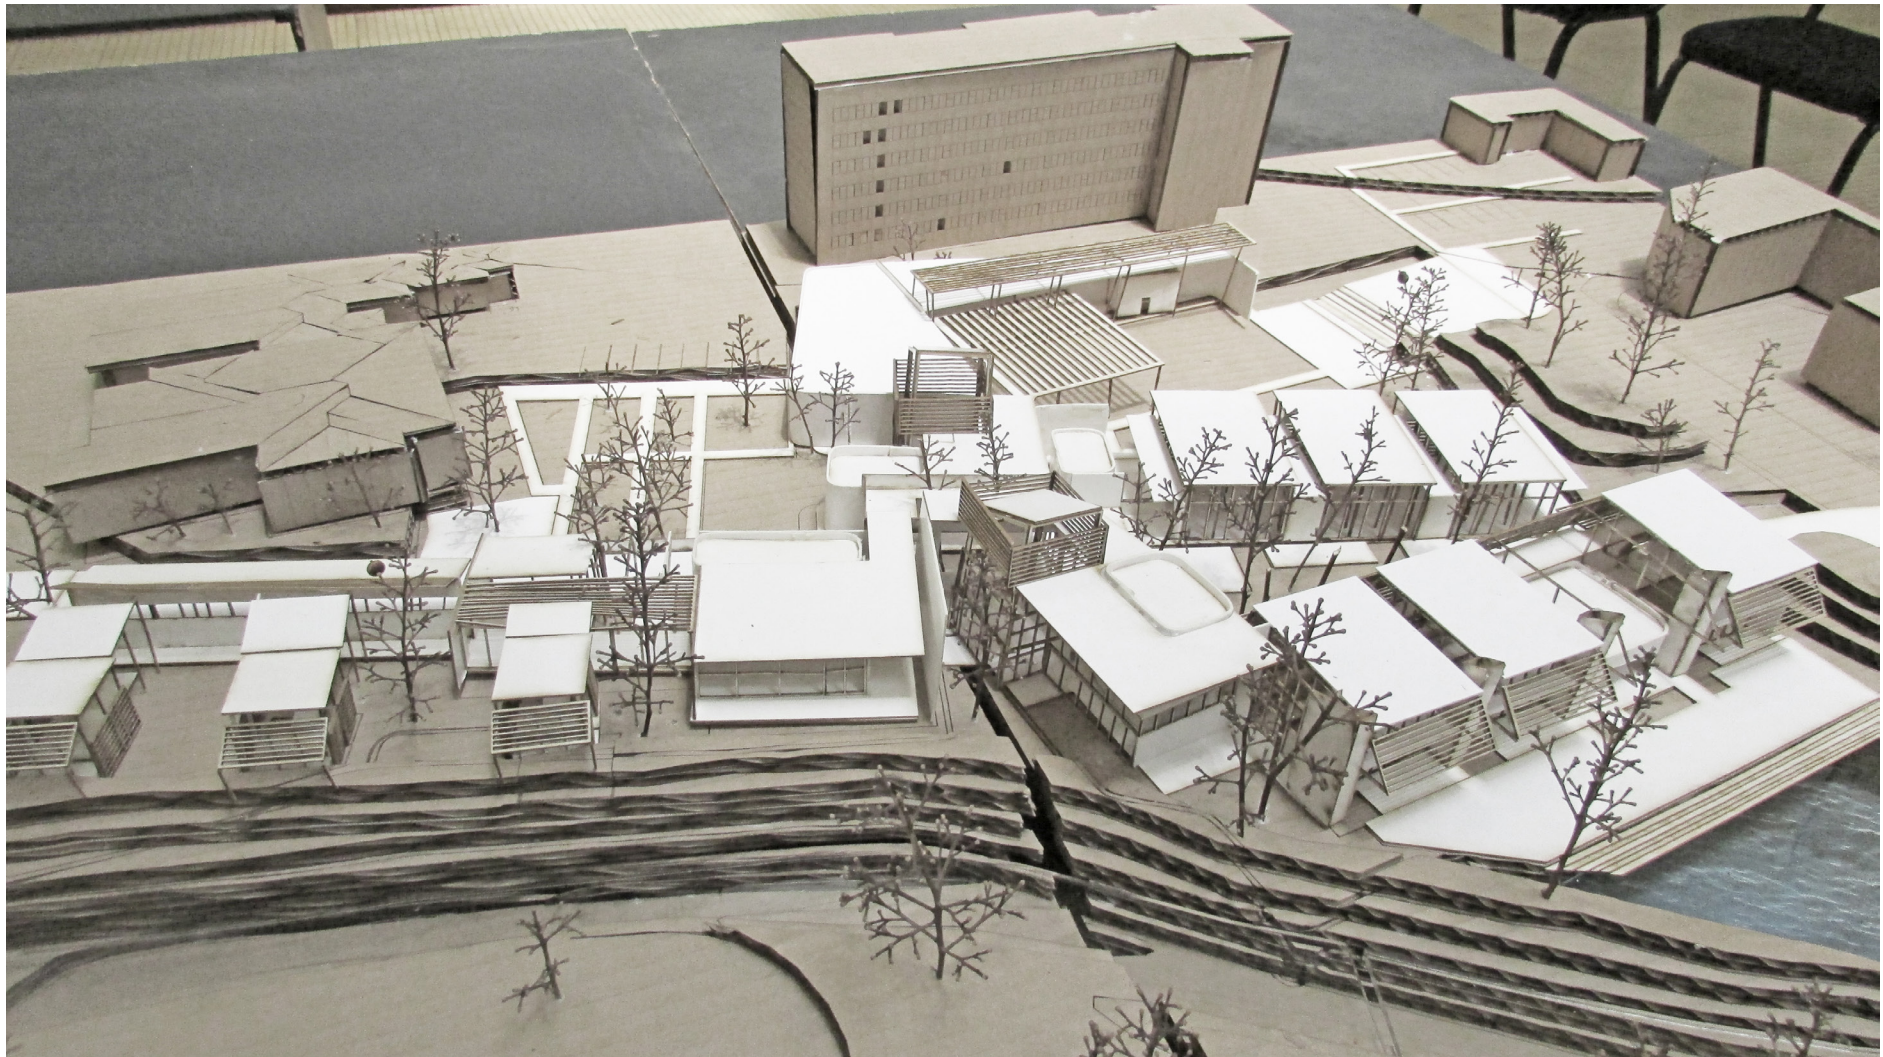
Final Model overlooking site towards the North (Author, 2016)
